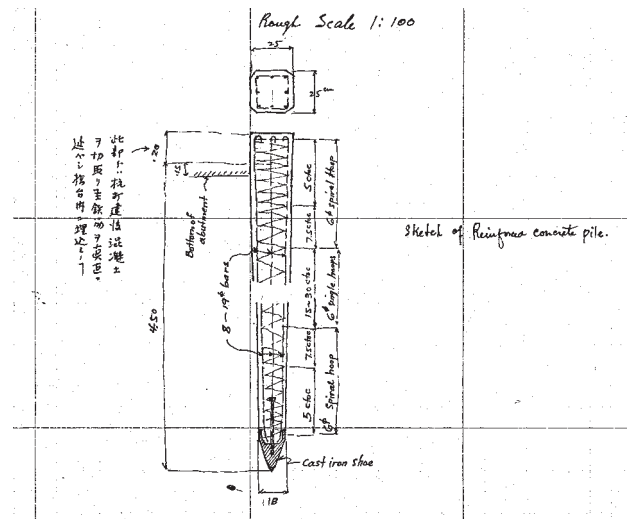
RC Concrete Pile for South Abutment (Mimitsu Bridge)
